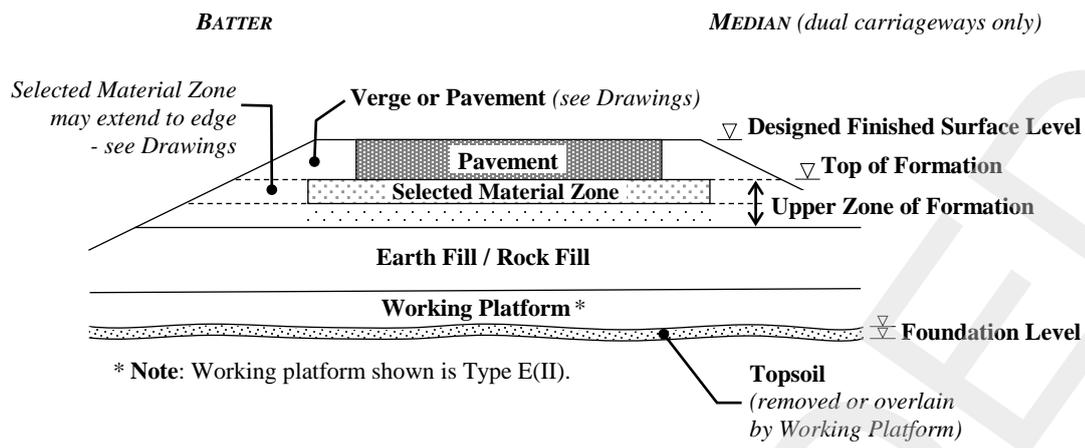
(c) – Embankment Foundation Treatment Type E3 – Working Platform
